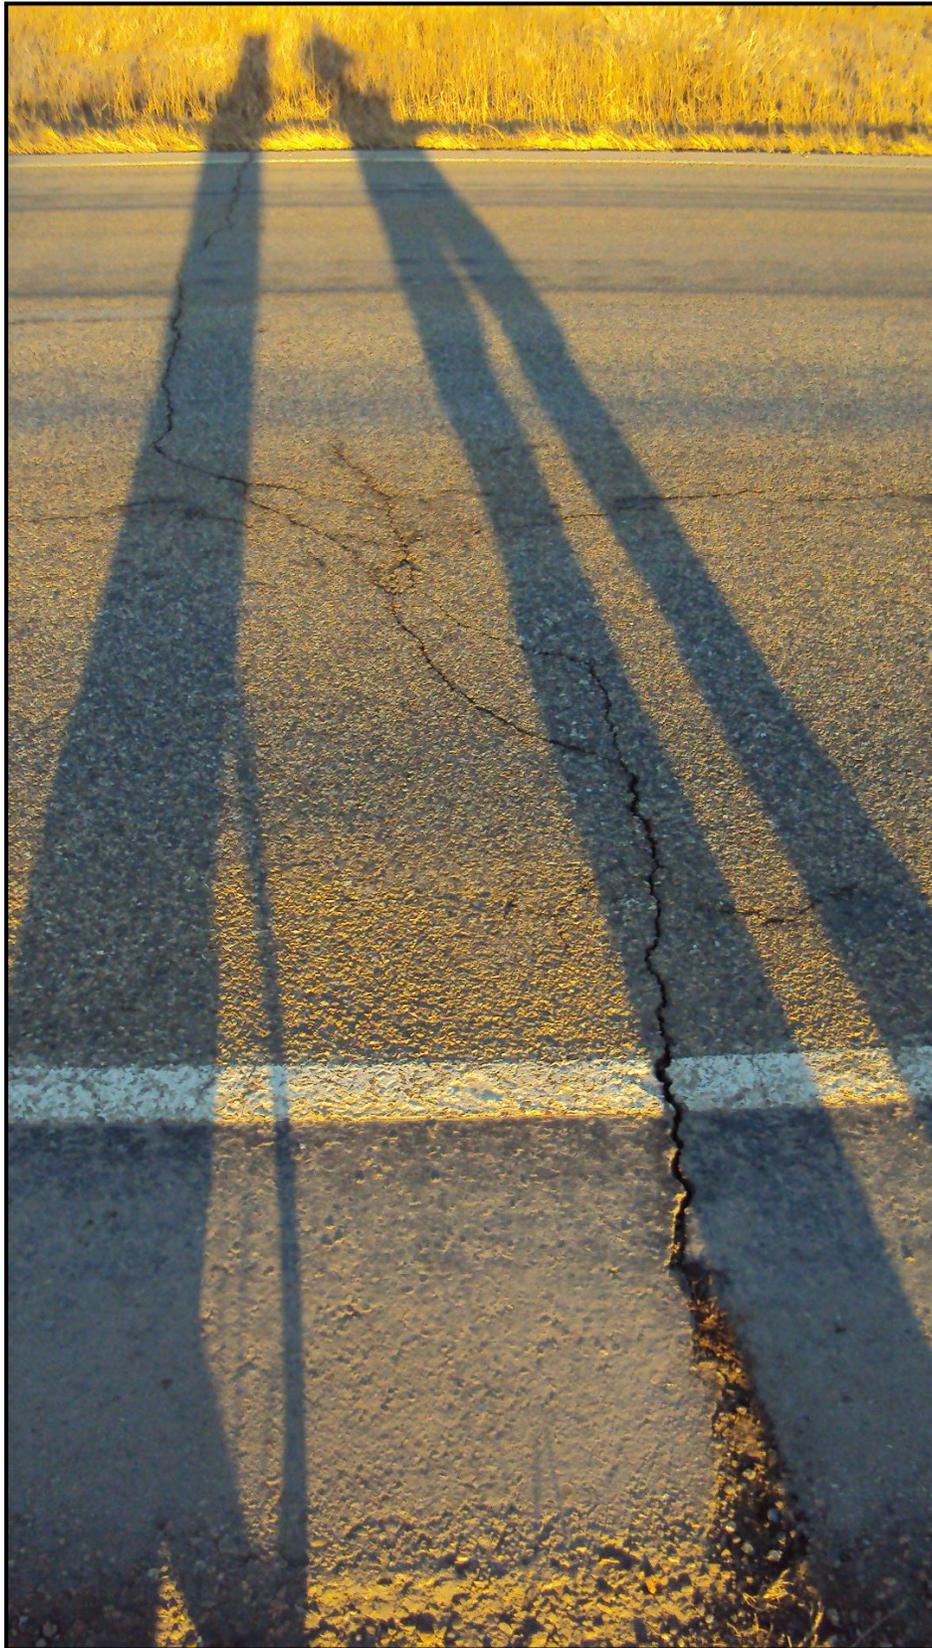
Looking north on MT 16. West side slope transitions from 5:1 to 3:1 approximately 17 feet from southbound travel lane. RP 16.4.
